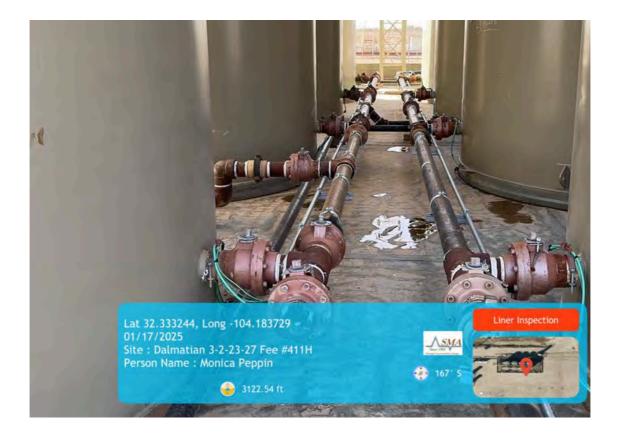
Facing west from southeast corner. Standing puddle of water from rain event day before.
